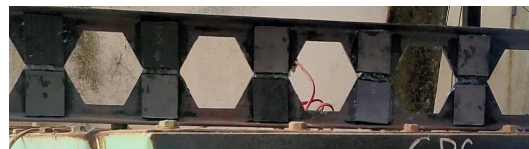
Final specimen of castellated beam with CFRP stiffener
